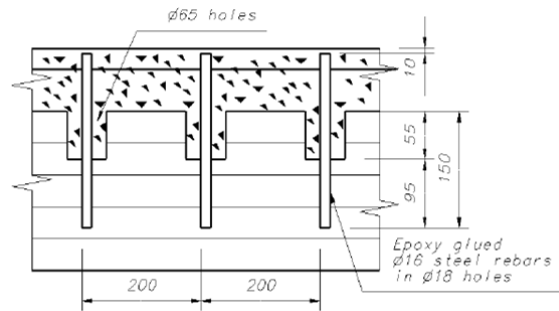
concrete stocky dowel with steel dowels epoxy glued to timber, Piazza and Ballerini 2000 (dimensions in mm)
